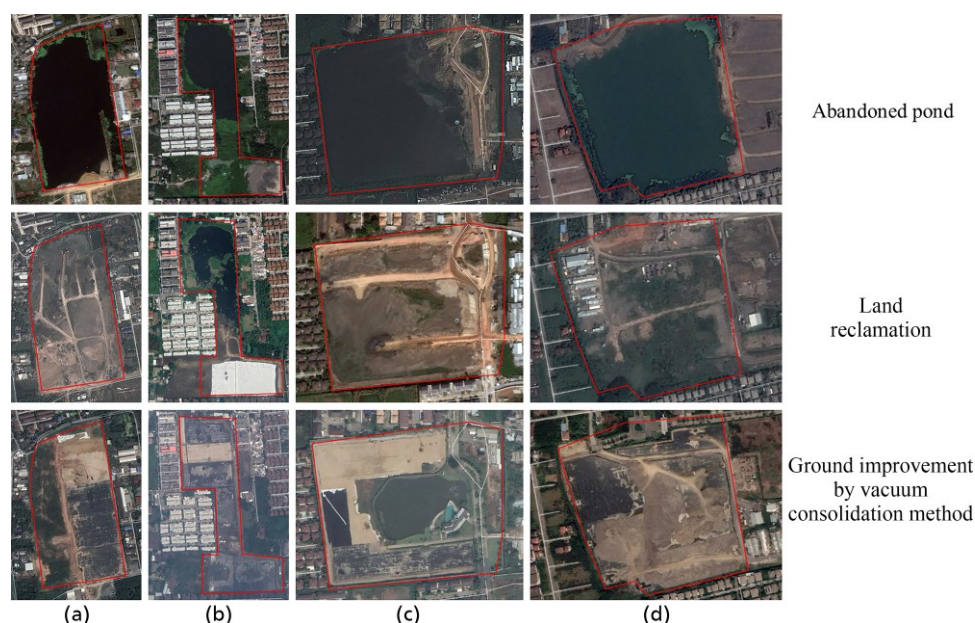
Reclamation and ground improvement process layout (a) BPW site (b) NOBLE site (c) BPI site (d) NSR & SSR site
